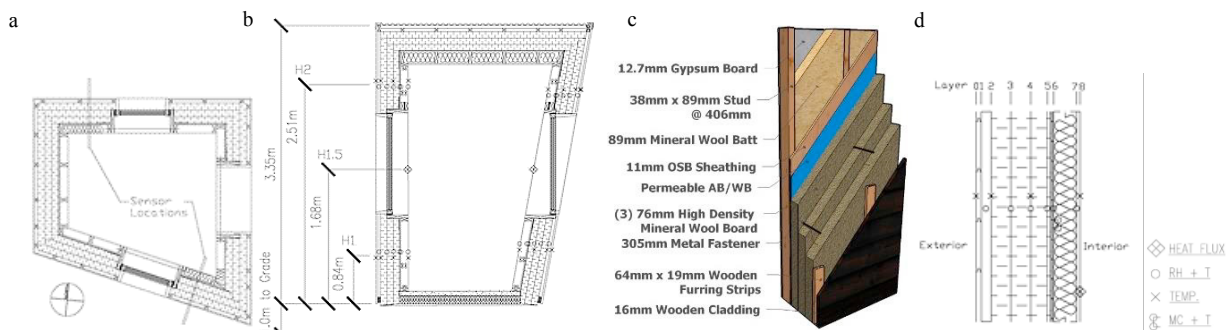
(a) Test Structure Layout; (b) Test Structure Section; (c) Enclosure Assembly; (d) Envelope Section - Sensor Placement
